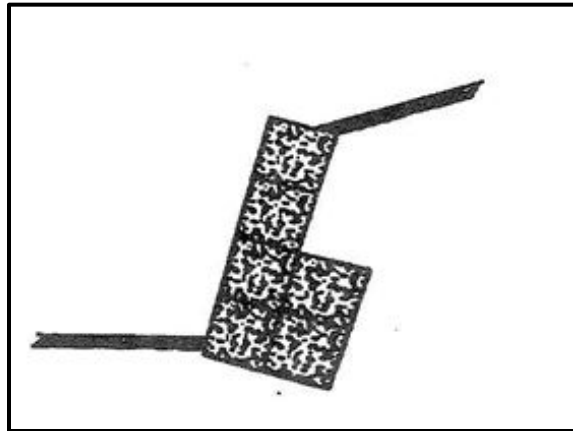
, Semi-Gravity Retaining Wall (Tanyu, et al. (2008))
